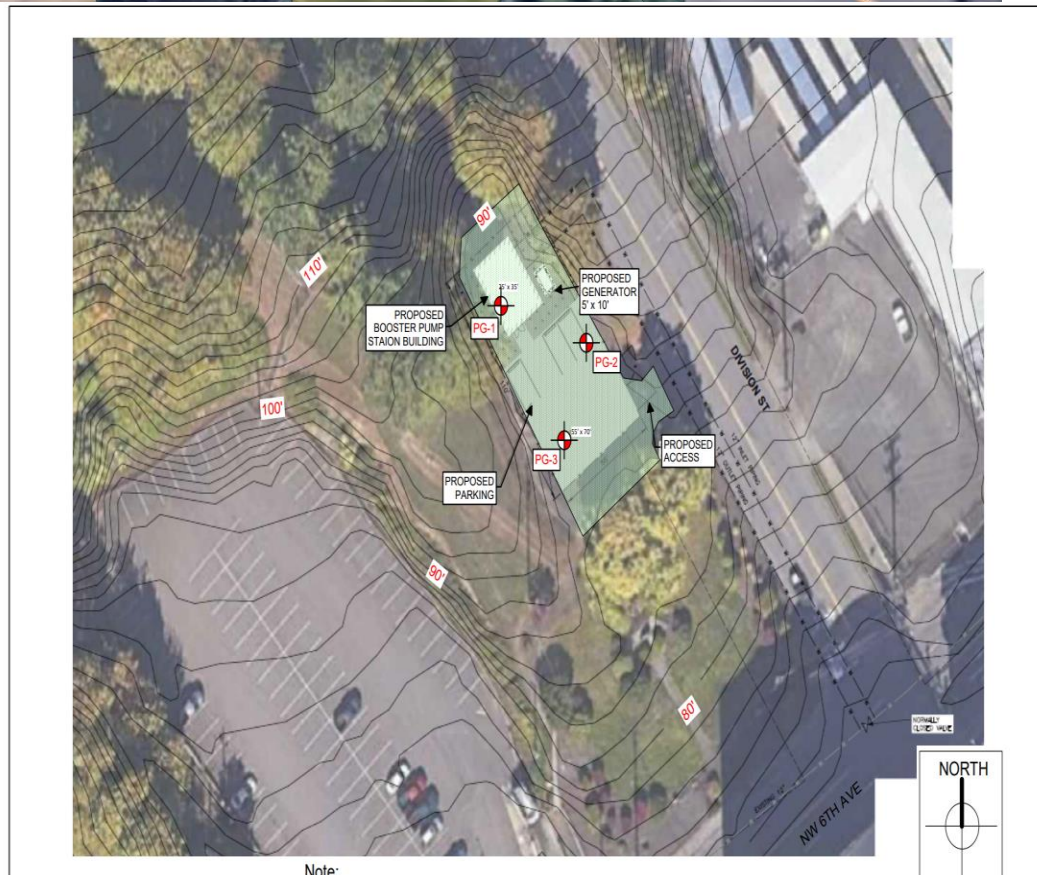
Proposed Booster Station located on Division Street north of NW 6th Avenue
